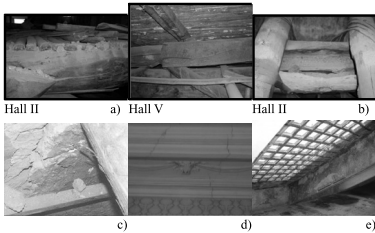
Damage in timber beams: a) overstressed beams; b) rain seepage effects. Crack distribution in masonries: c) walls; d) vaults; e) rain seepage effects.
